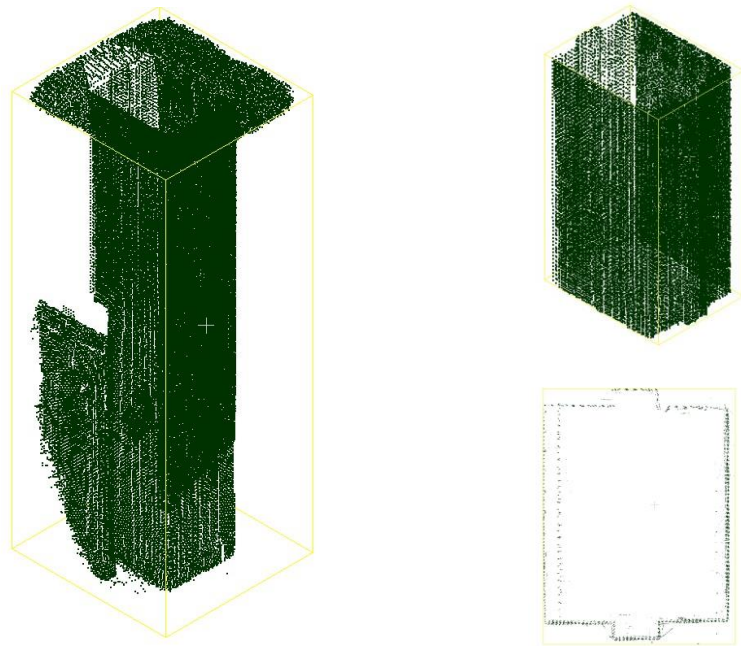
Column over segmentation and horizontal slicing for an accurate reconstruction. Left: segmentation of column instance. Right: horizontal slice providing an accurate reconstruction.
